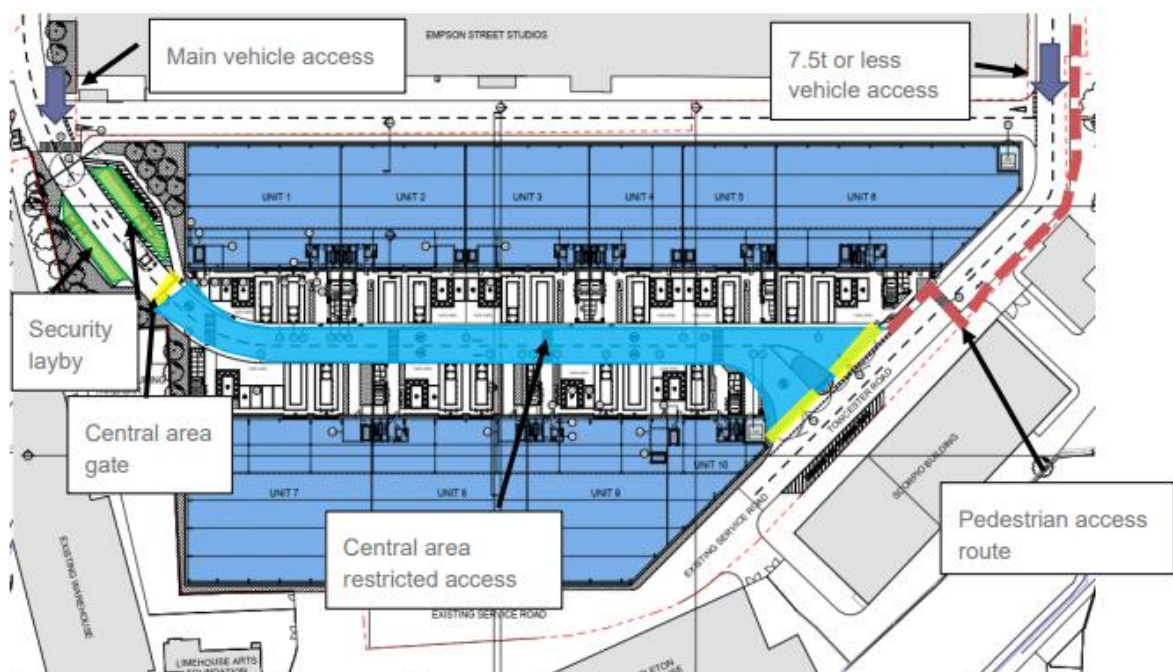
Delivery and Servicing Plan including Waste Management (DSP).
